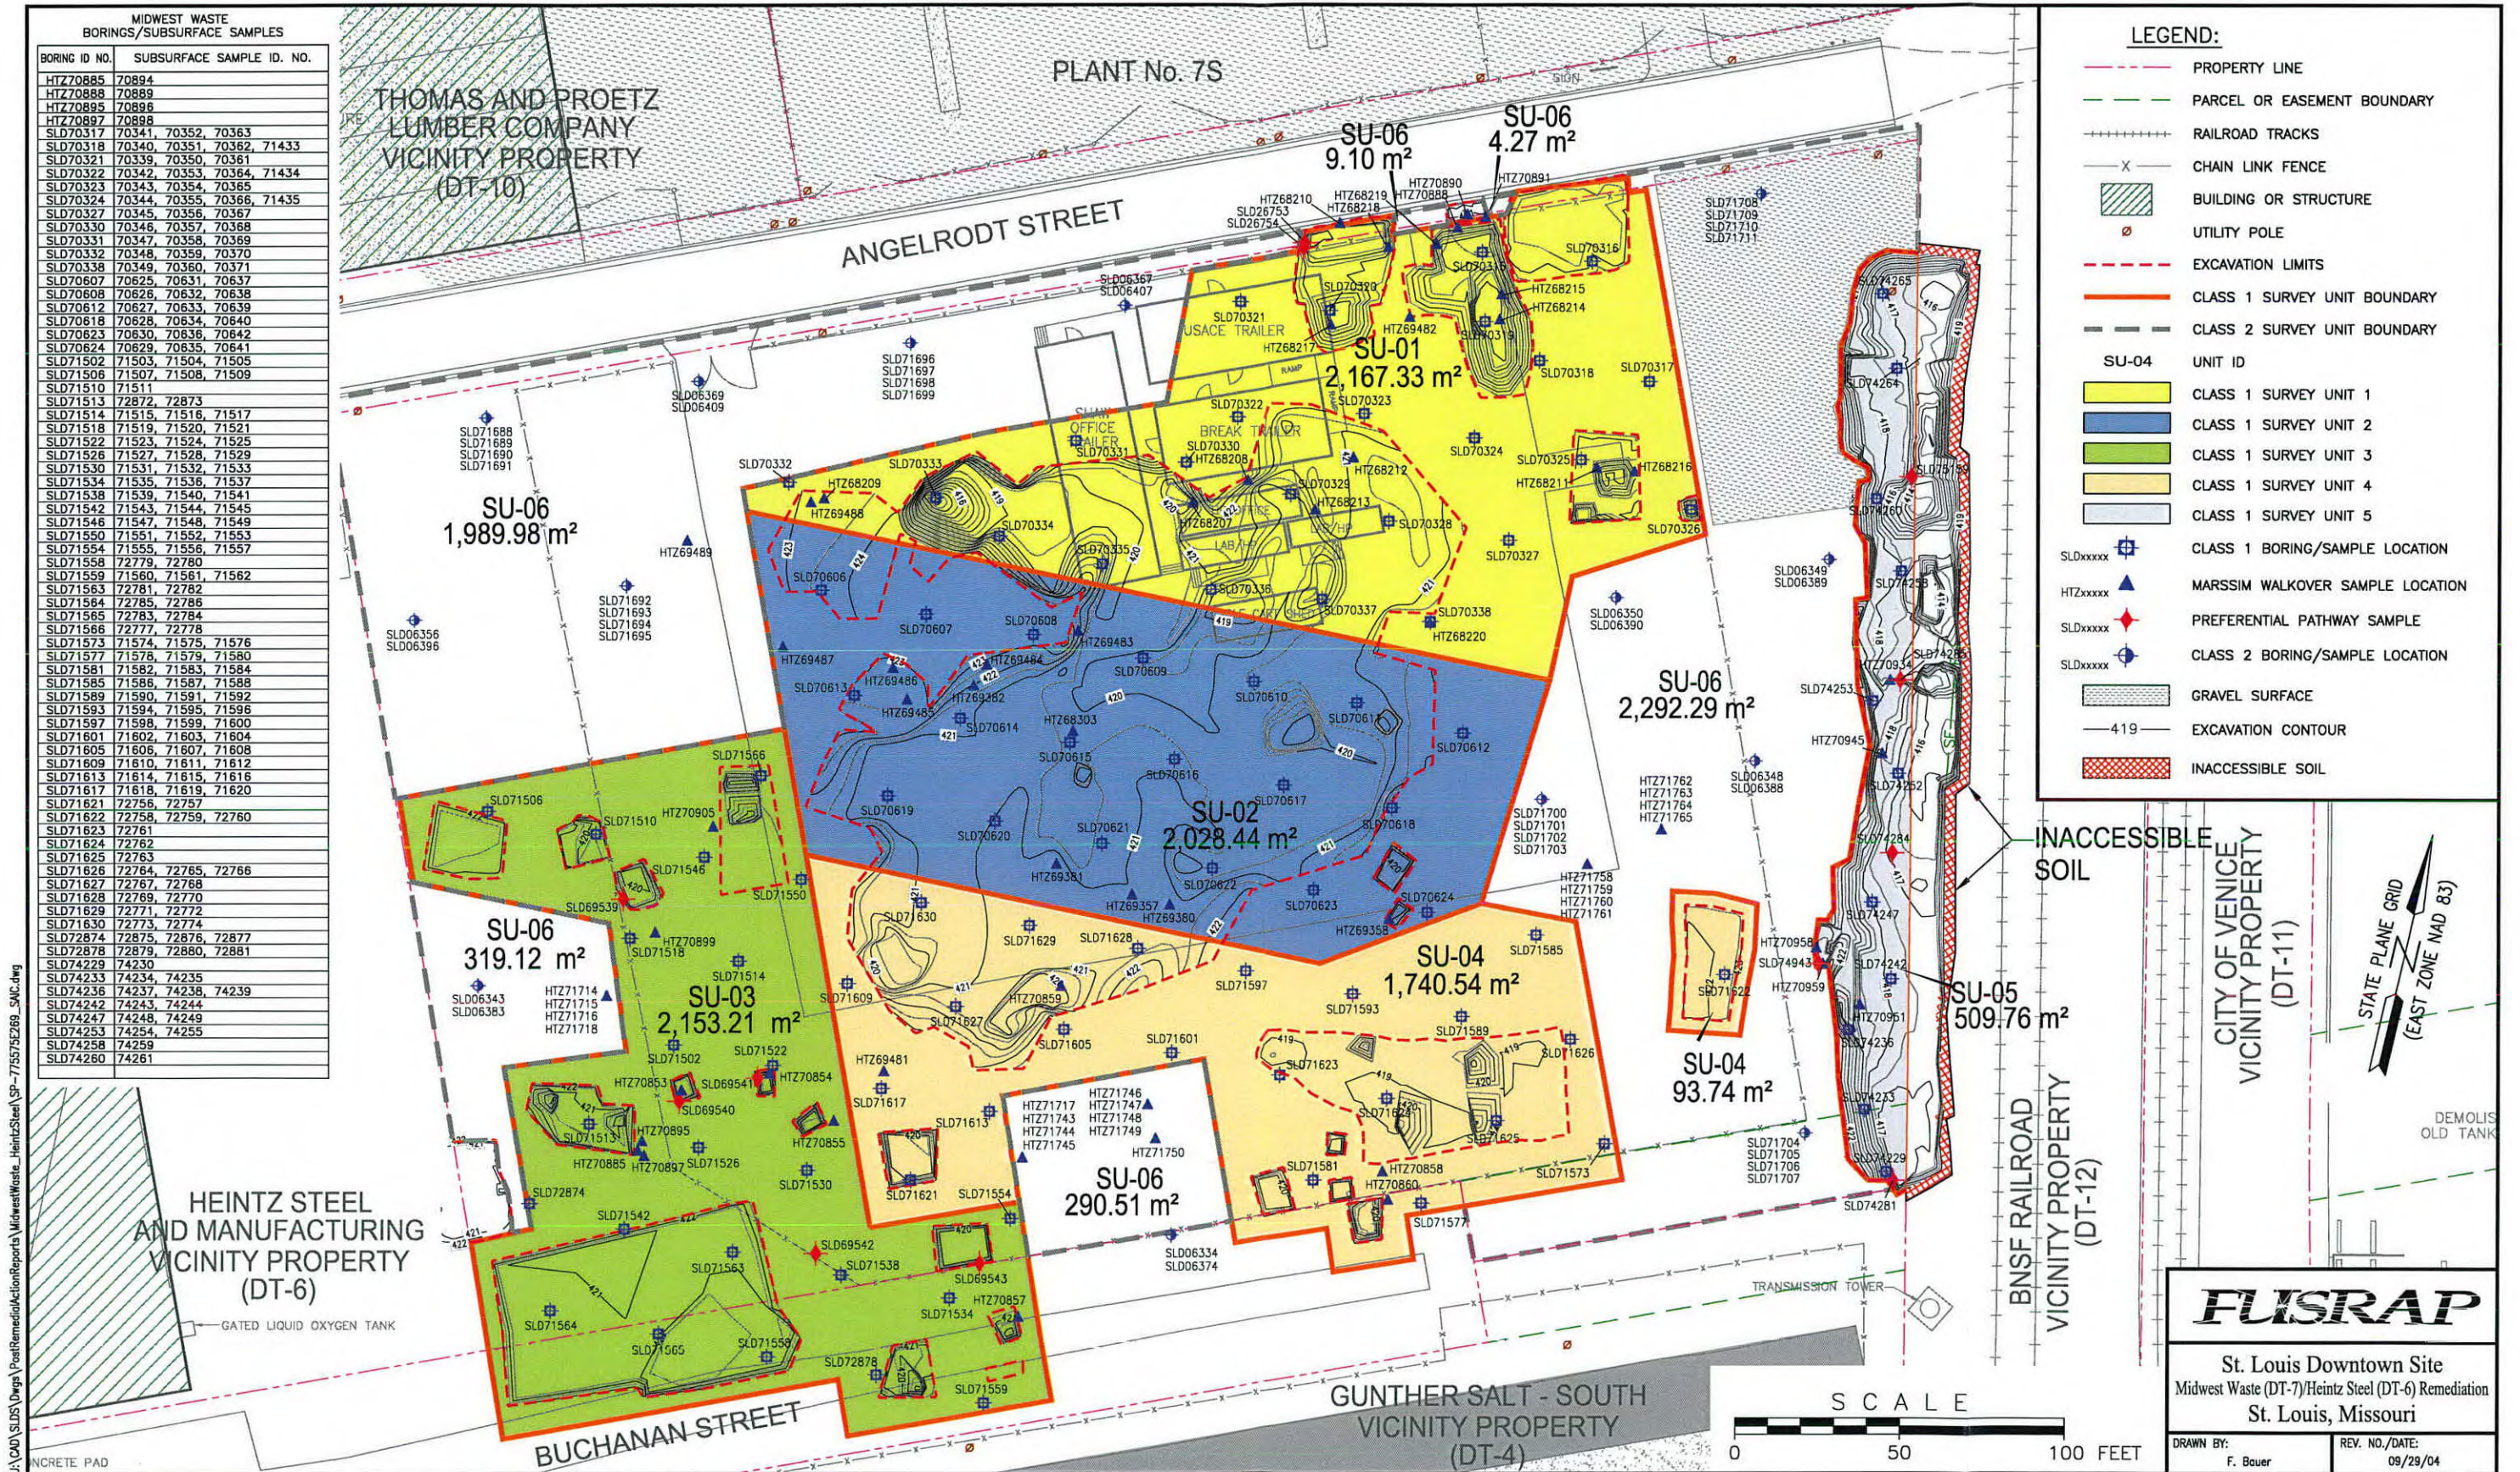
As Built Excavation Areas and Survey Units, DT-7
